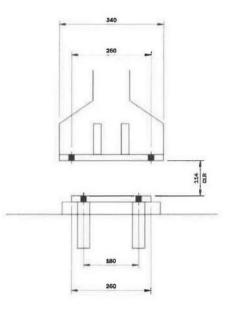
Sketch highlighting typical fixing dimension details - transverse section
